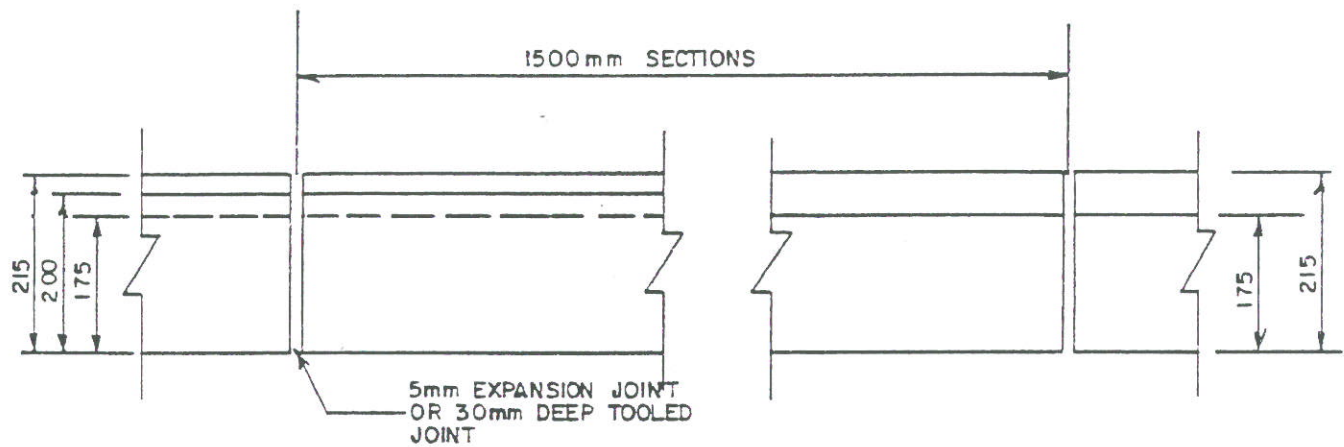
DETAIL FOR BACK OF WALK FOR 150 MONOLITHIC STANDARD CURB & GUTTER
